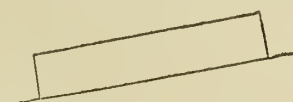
UNLEVELLED HOUSE, INCORRECT.
